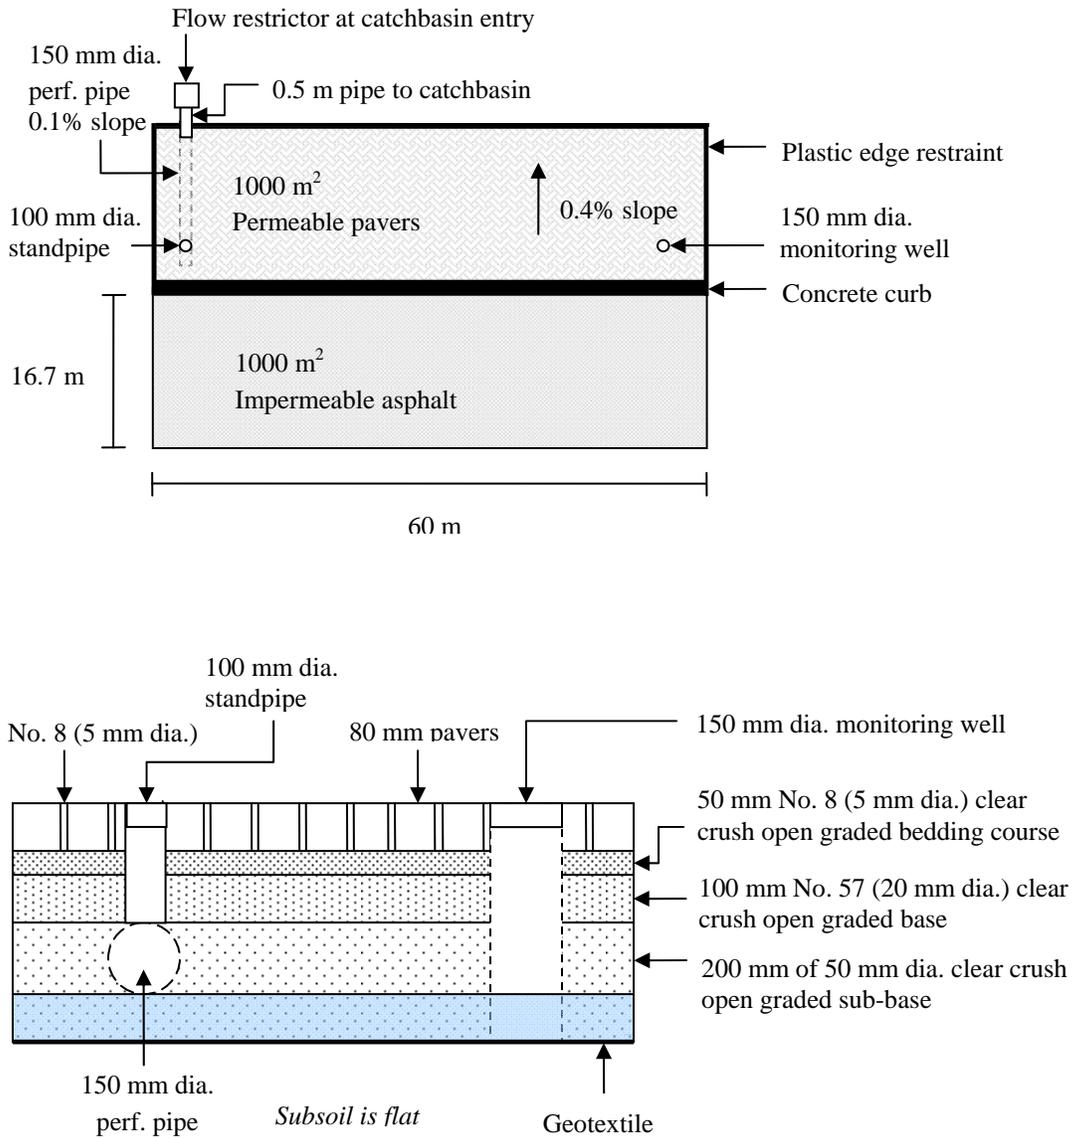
Permeable pavement partial infiltration design. Plan view (top); cross section (bottom)
